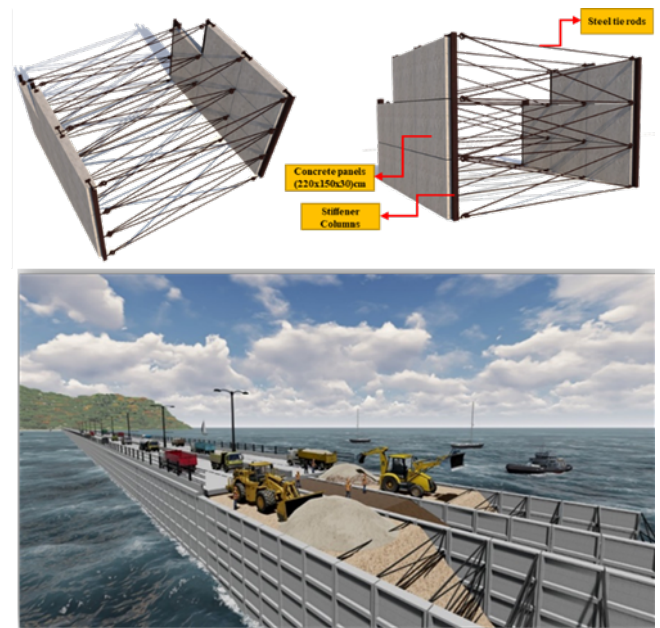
Illustration of the concrete panel with steel rods for seawall construction
